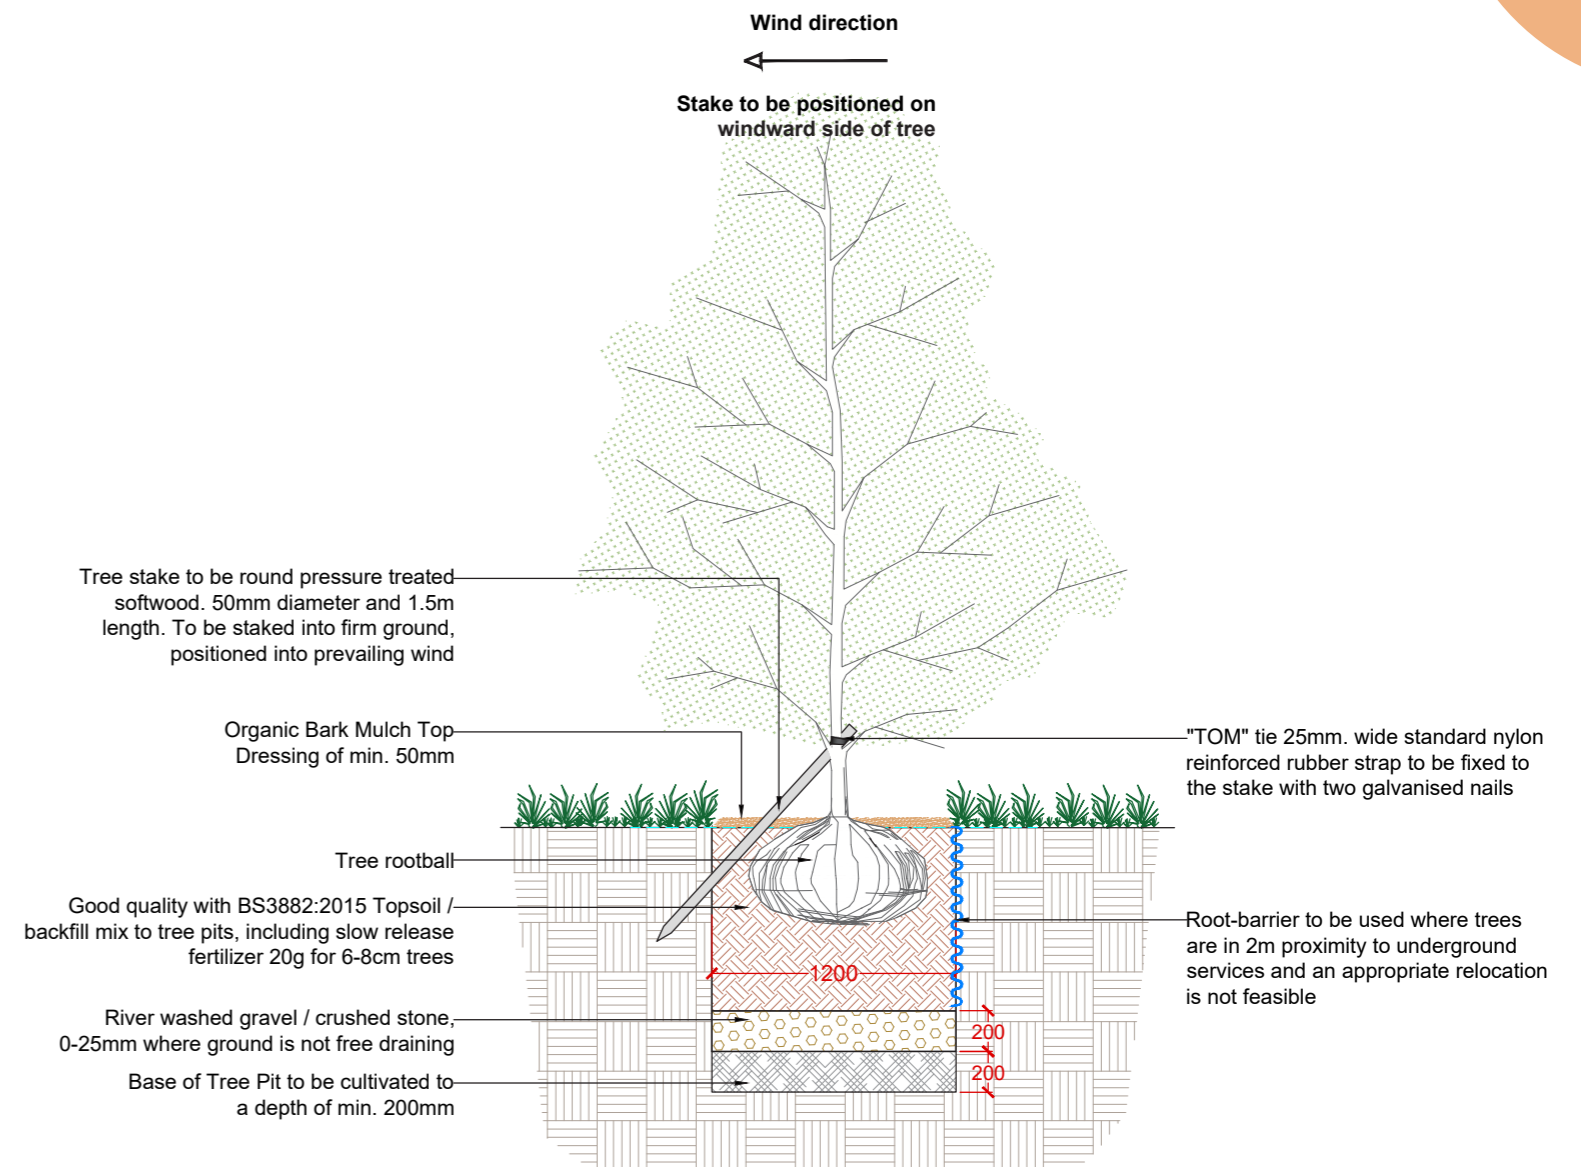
Standard Tree Pit Detail with a Single Stake
